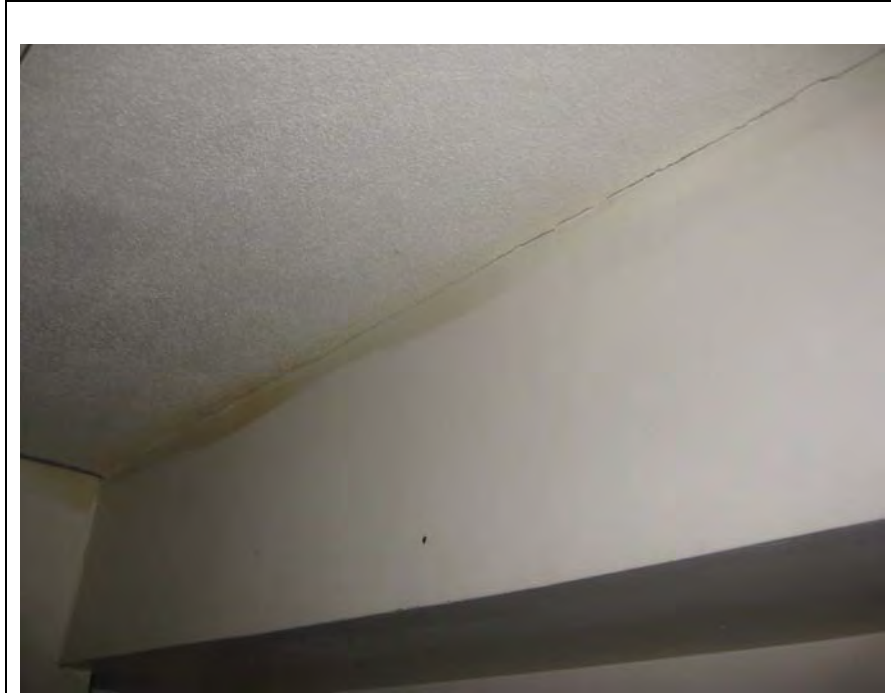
Gap between drywall and floor/ceiling assembly at second floor
